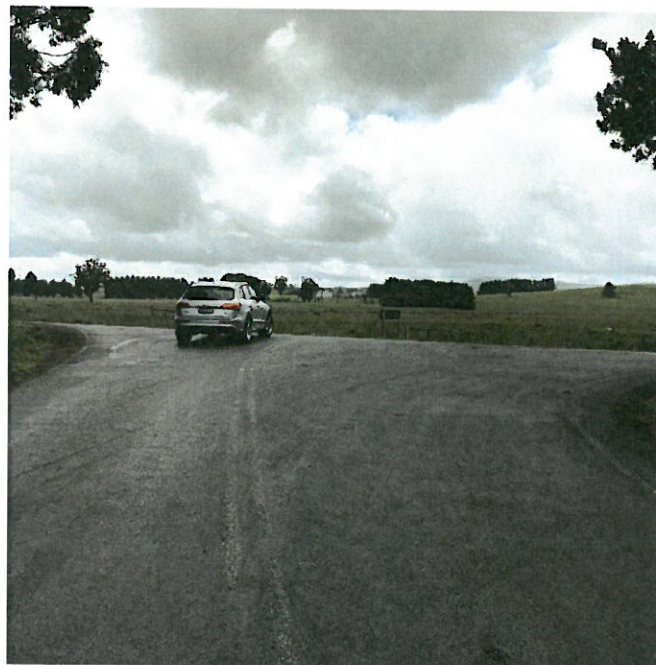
Break O Day Rd looking east (towards Melba Highway)
